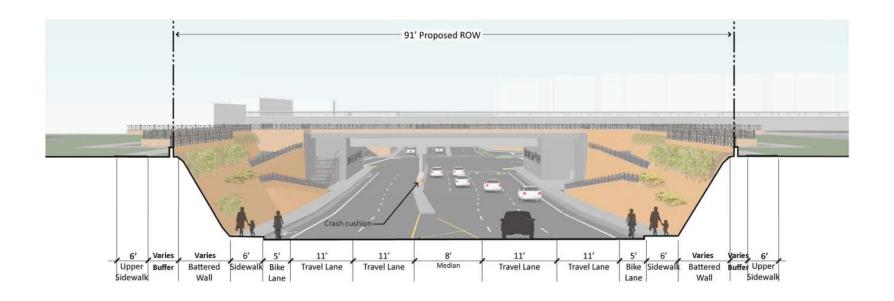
Concept C, Northbound Rengstorff Avenue Cross-Section
